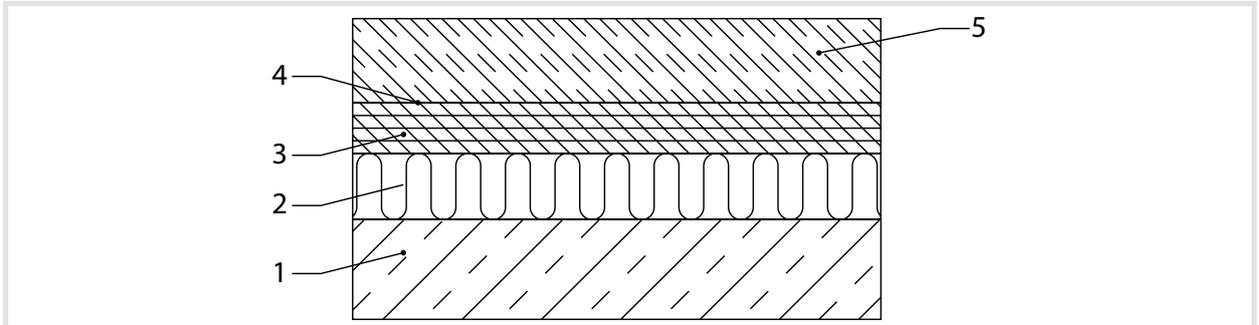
Concept drawing of the reference area test setup in the ceiling test station
